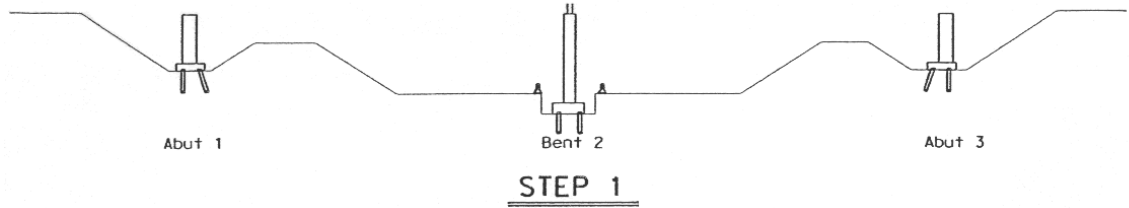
CA Post-Tensioned "Wide-Flange" Girder
